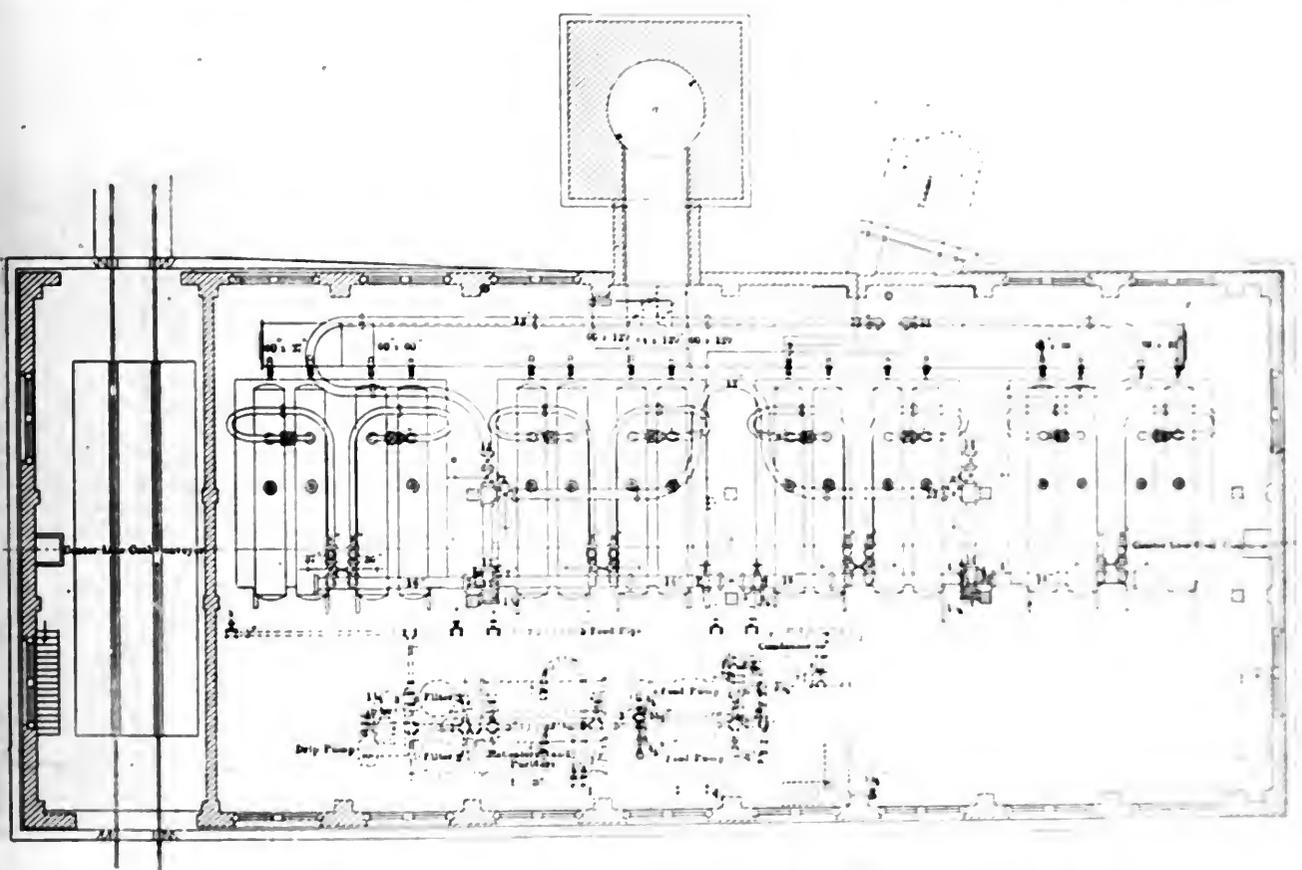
PLAN OF STEAM PIPING IN BOILER HOUSE AND FEED WATER APPARATUS IN BASEMENT
